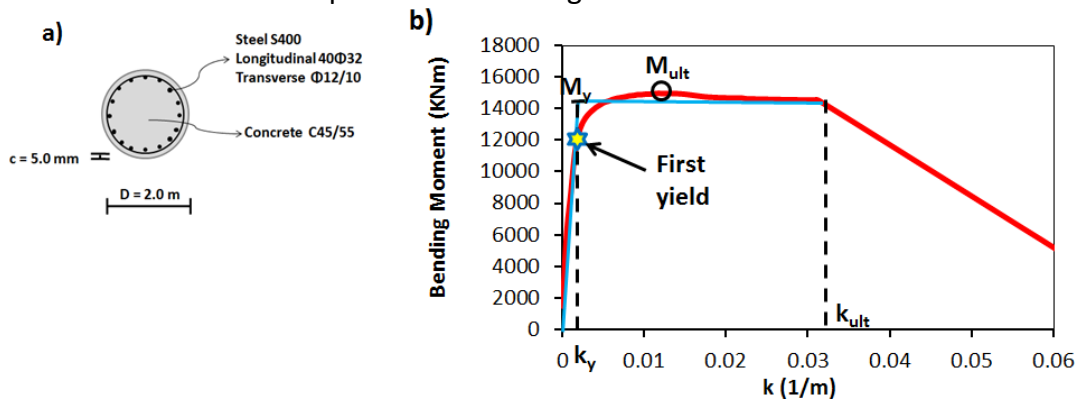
(a) Geometry and reinforcement of the reinforced concrete sections (b) moment – curvature relationship at the pier base
